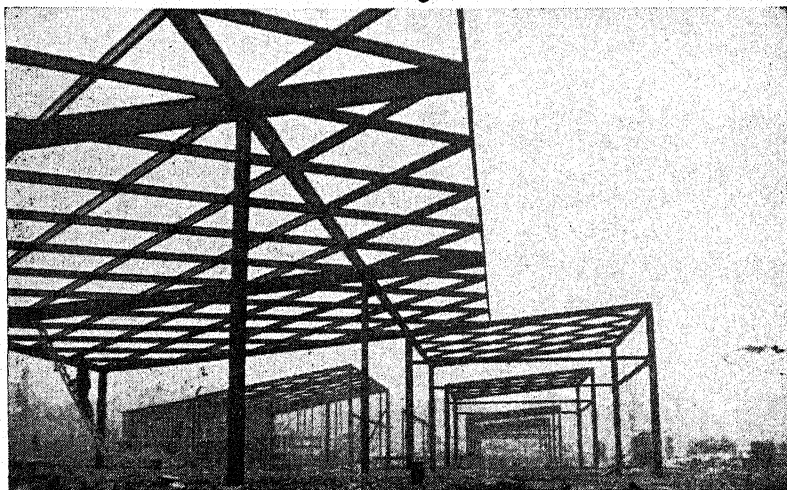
Photo of grids in roof of open air school at Manchester, England.
